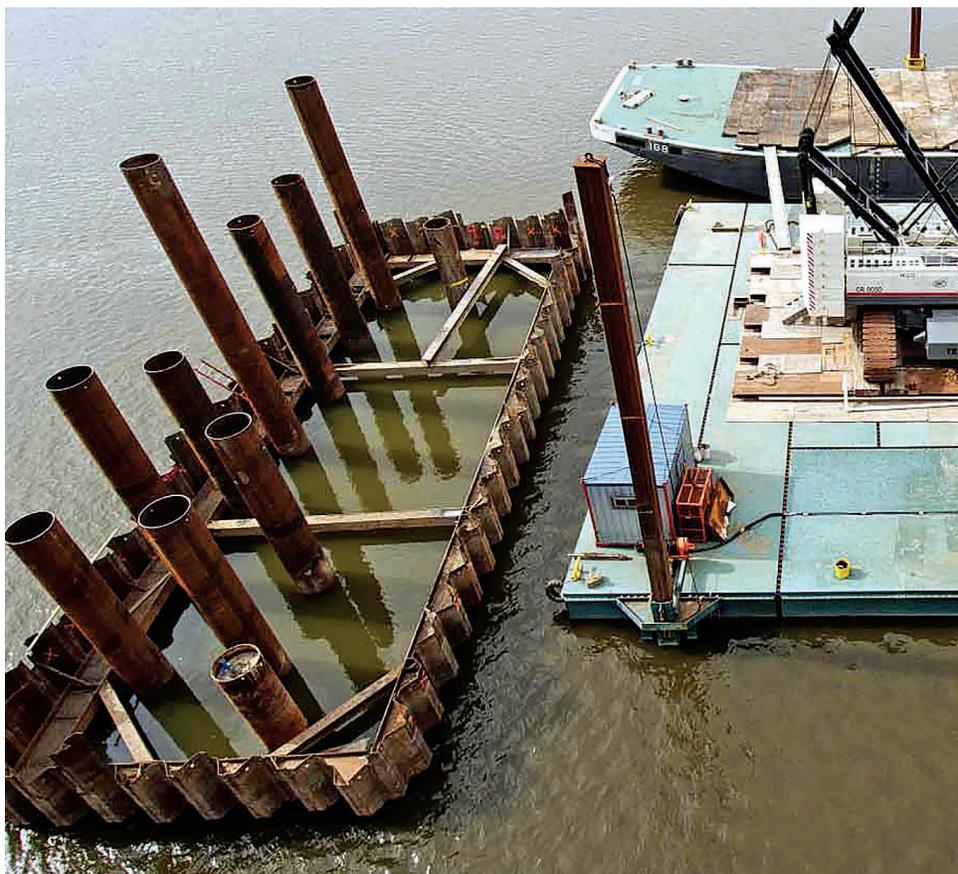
Hastings Bridge piers 6 and 7 during construction.
